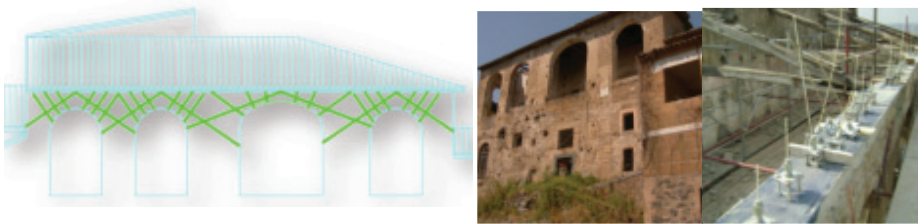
Strengthening of masonry arches using pretensioned FID-ASLAN 100 GFRP bars.
